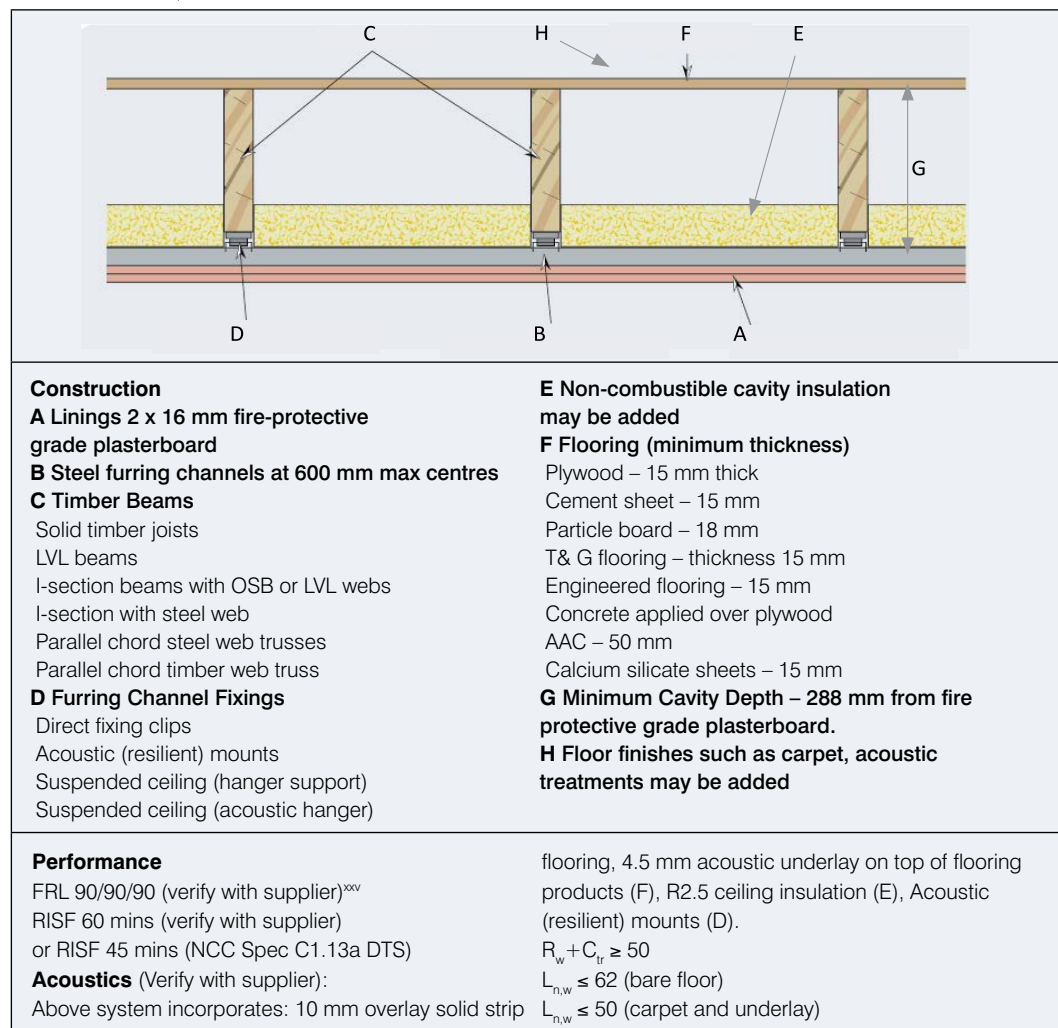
Sound performance of typical timber-framed floor/ceiling system.
